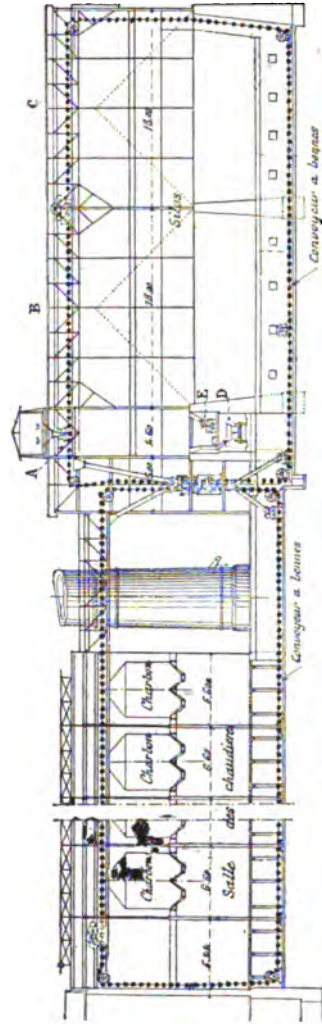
Coal and Ash Handling System, St. Denis Plant, Paris.
